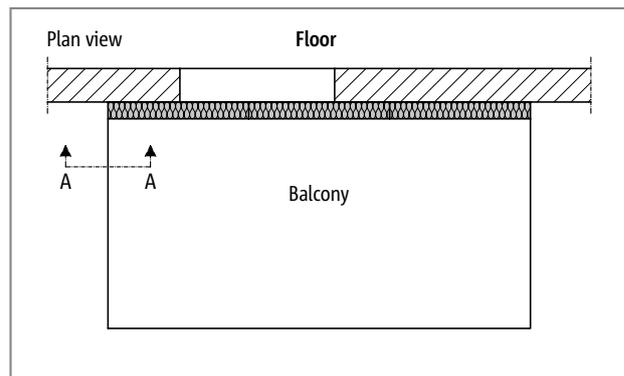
Schöck Isokorb® XT type K: Diagram of the position of Section A - A
